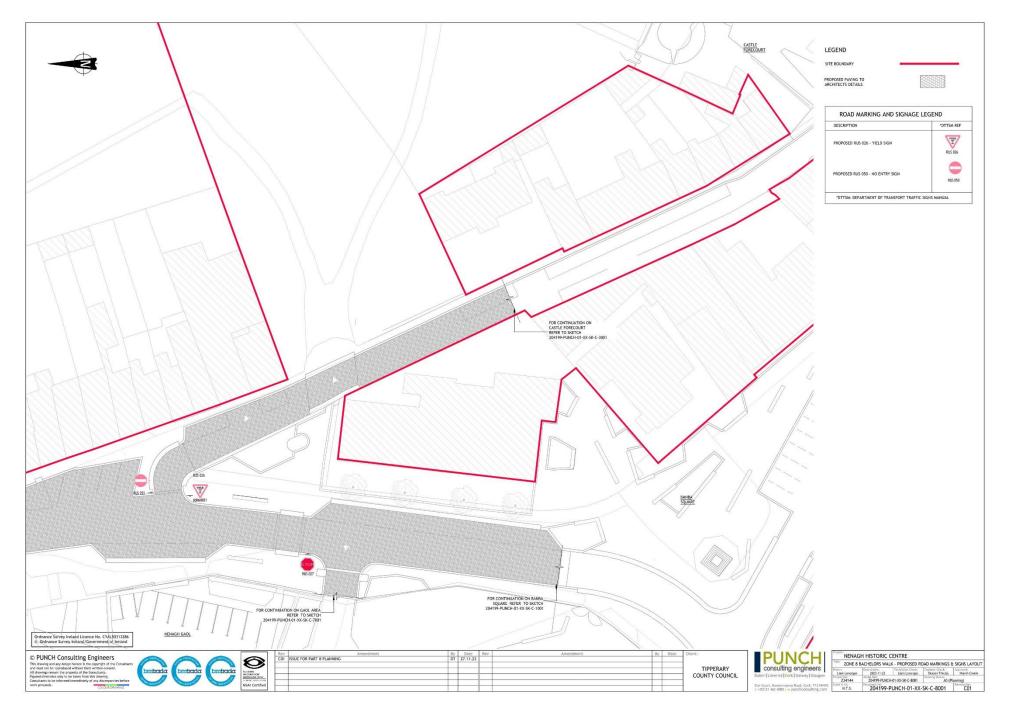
Proposed Road Design O'Rahilly Street & Tourist Office/Former Town Hall (NHCQ Zone 8)
